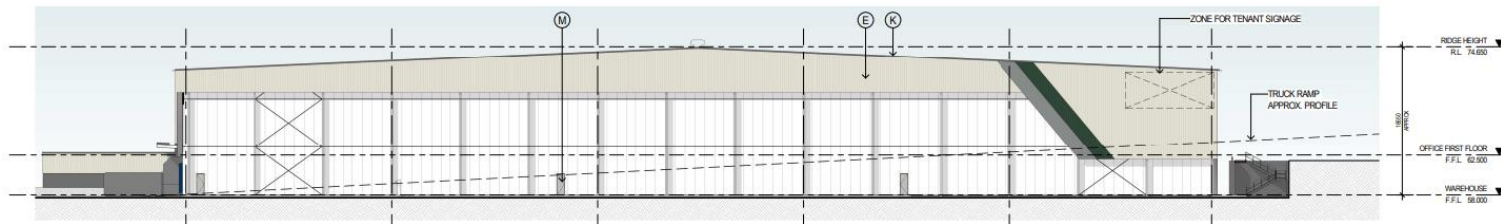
Proposed Southern Elevation (Source: Watson Young)
